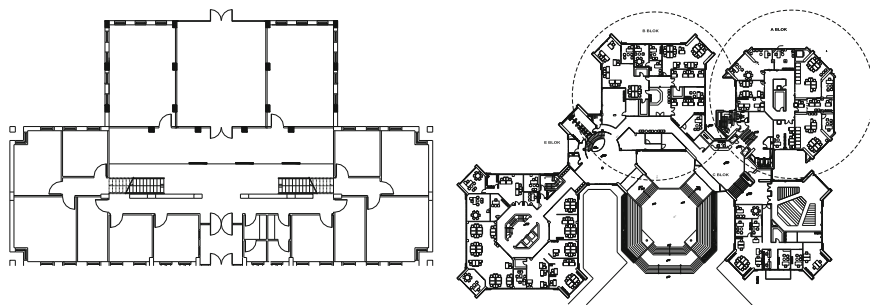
Ground floor plans of GIT faculty of architecture and KMM buildings
